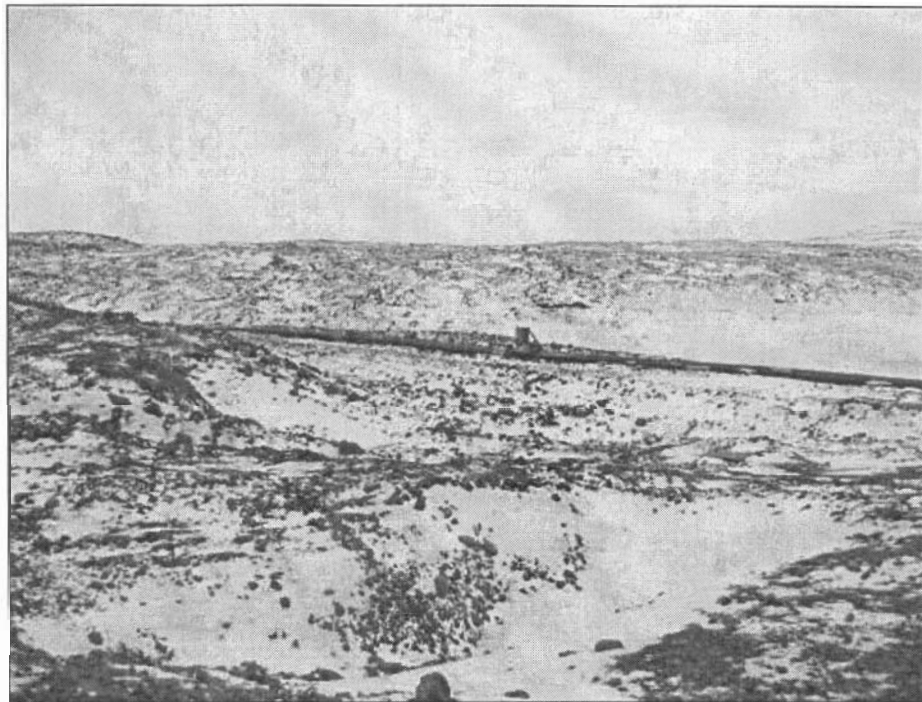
Site of excavation where tailings spill had occurred; tailings line is clearly visible
